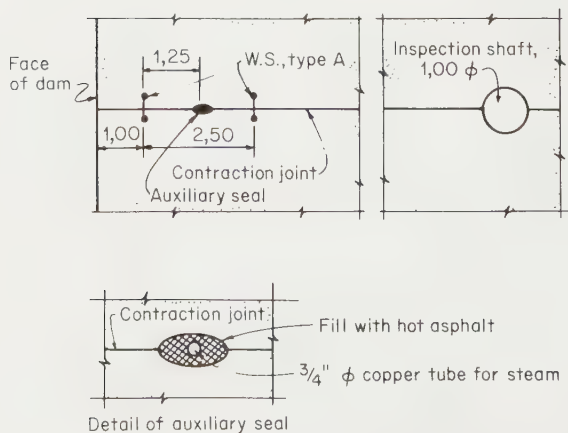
Guri Dam, Caroni River, Venezuela. Transverse joints, details of water stops and drains.
